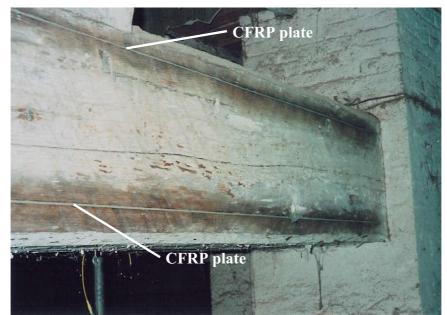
Strengthening intervention in Palazzo Nobili (Designer: dr.ing. M. Martinelli - Legno Più S.r.l.).
